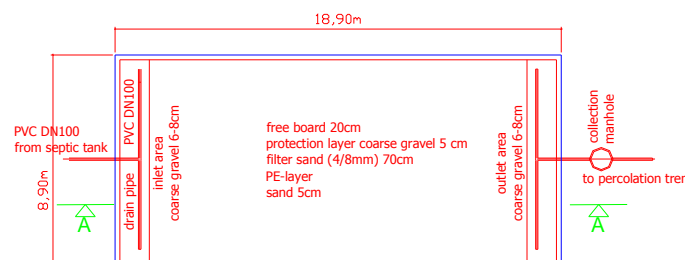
Plan view – horizontal flow constructed wetland, Kalungu (source: EcoSan Club, 2009)
